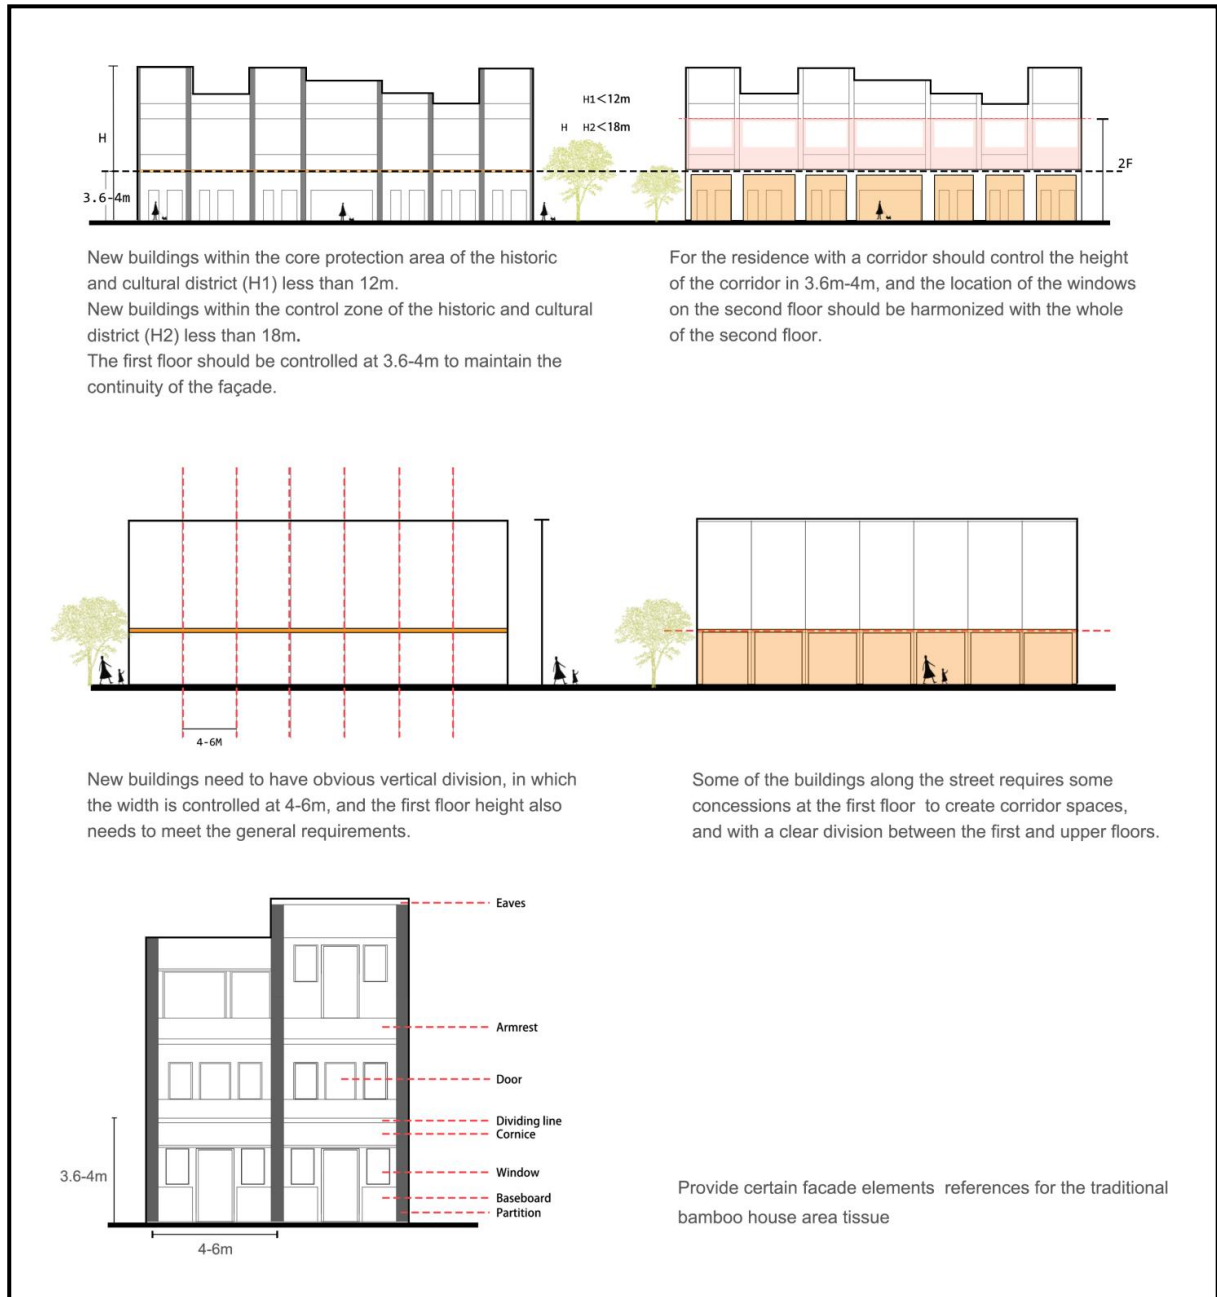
Guidelines for the control of building facade in the traditional Bamboo building area (Source: the author)
